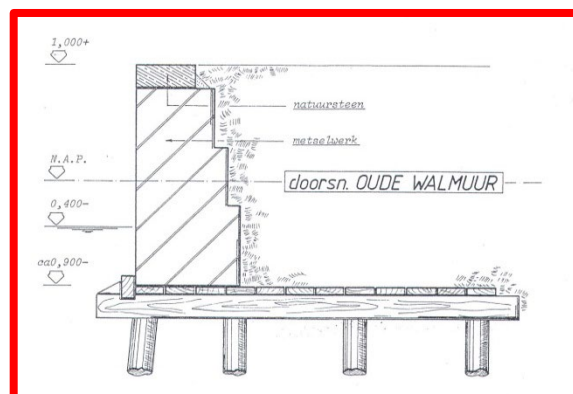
Presumable cross-section type 2 quay walls (Amsterdam.nl)
